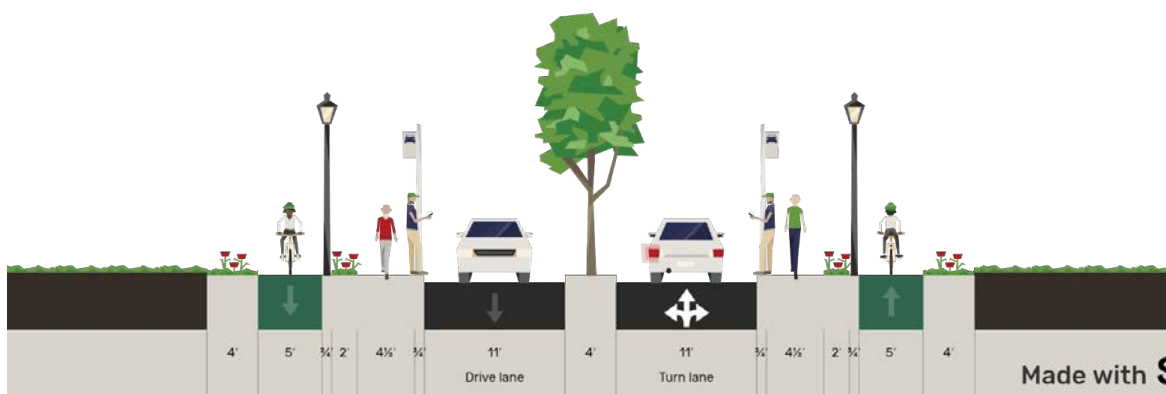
Sidewalks will be placed on both sides of the street. As vehicles approach the intersection with Cloverdale Drive, bikes would be separated to be more visible to drivers. Bikes and pedestrians should have the walk/bike signal a few seconds before drivers have a green light for maximum visibility. Diagram created in Streetmix by EC, 2022.
